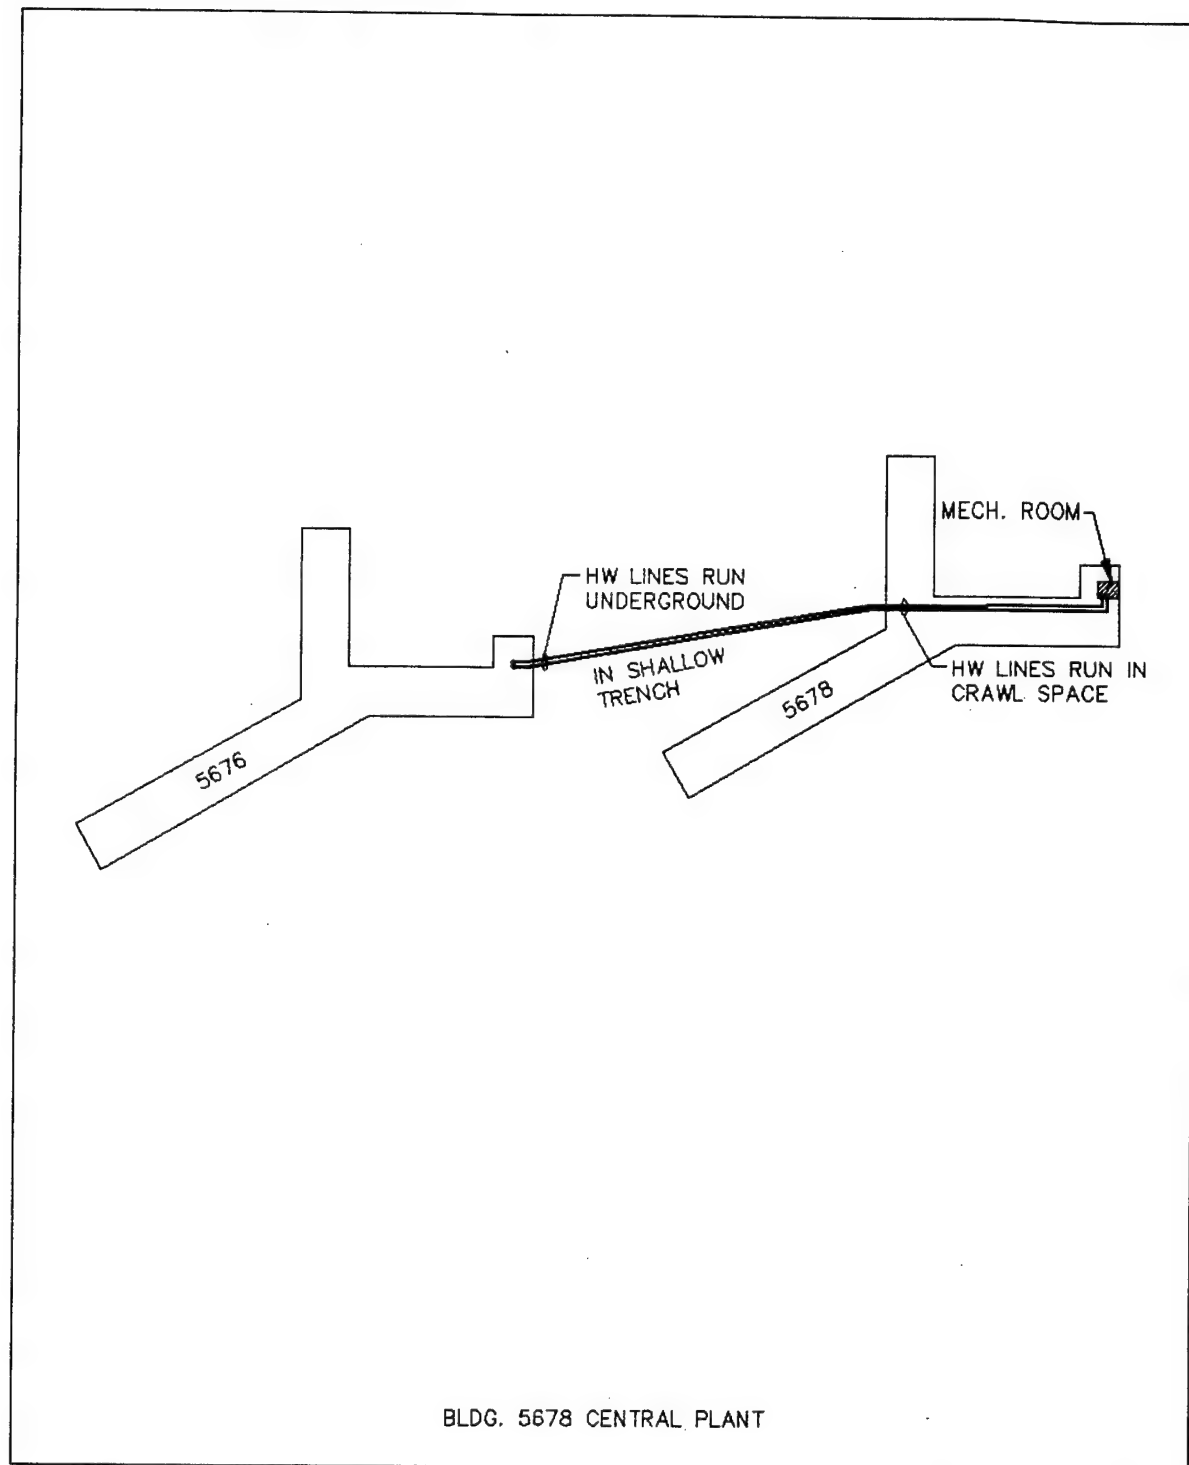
DISTRIBUTION PLAN, CENTRAL PLANT 5678
